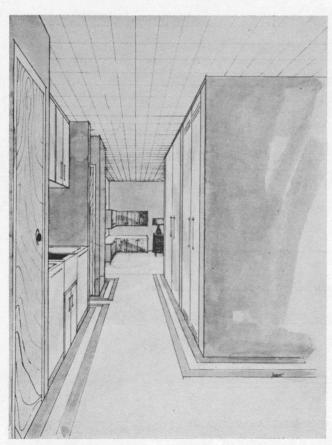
Perspective of the utility area looking from the garage door toward the living room area. Wall unit on the right provides storage space for heating and cooling systems, water heater, roll-away bed and guest closet.
